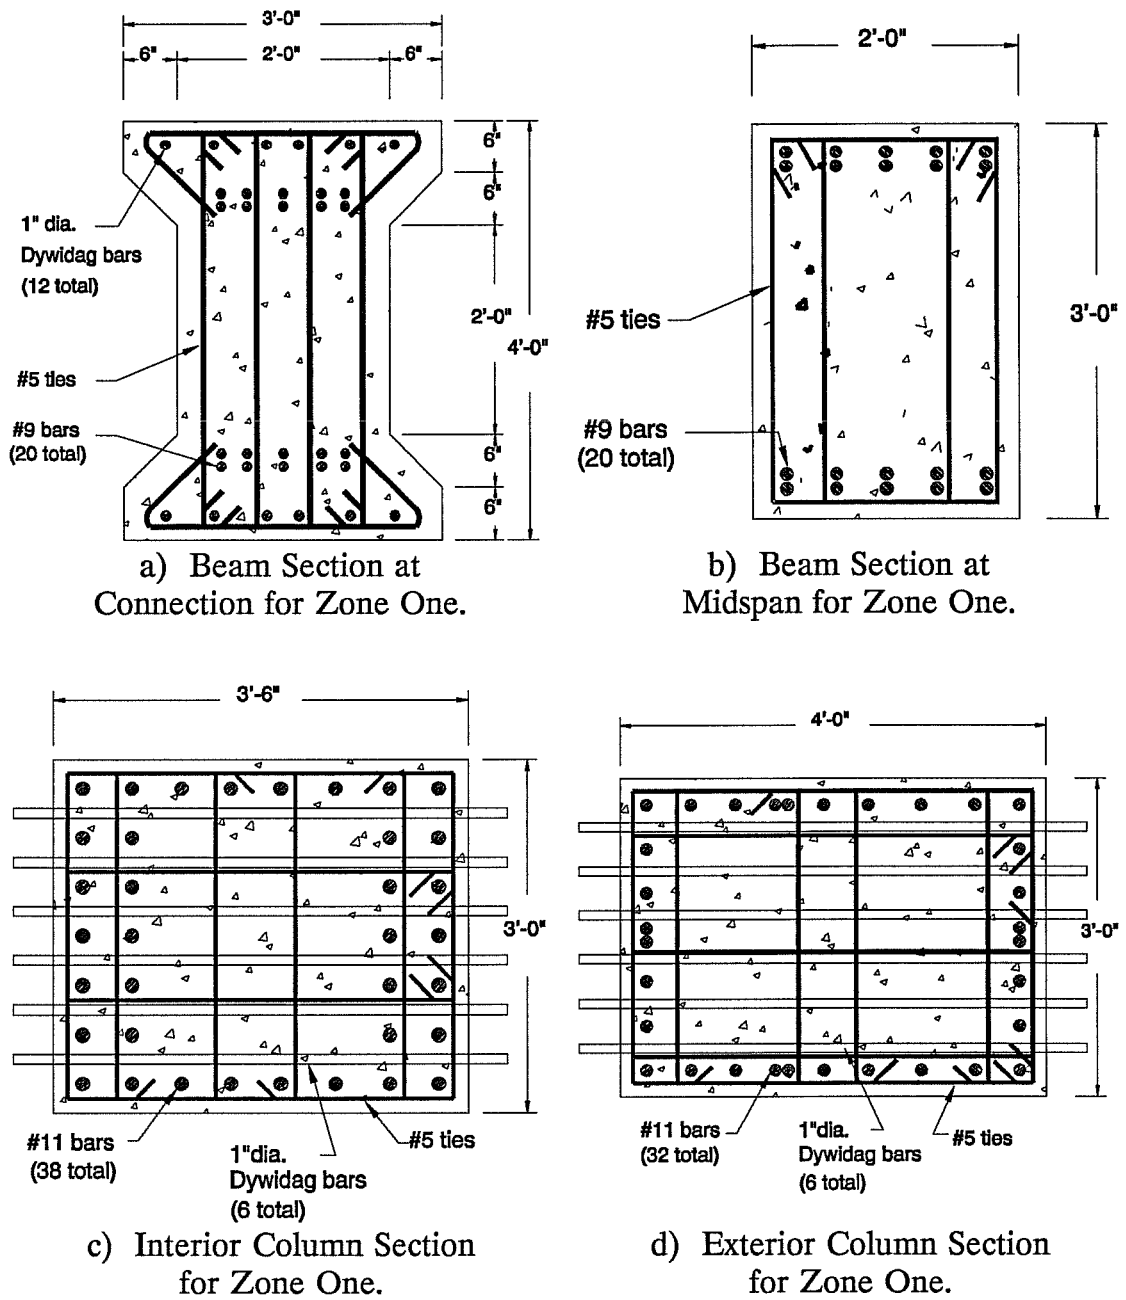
Typical Beam and Column Cross-Sections for 15-Story Prototype Structure.
